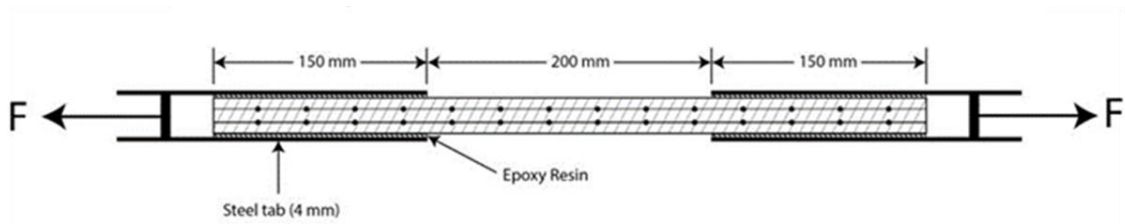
Cross-sectional view of the test specimen with two-layer carbon textile
